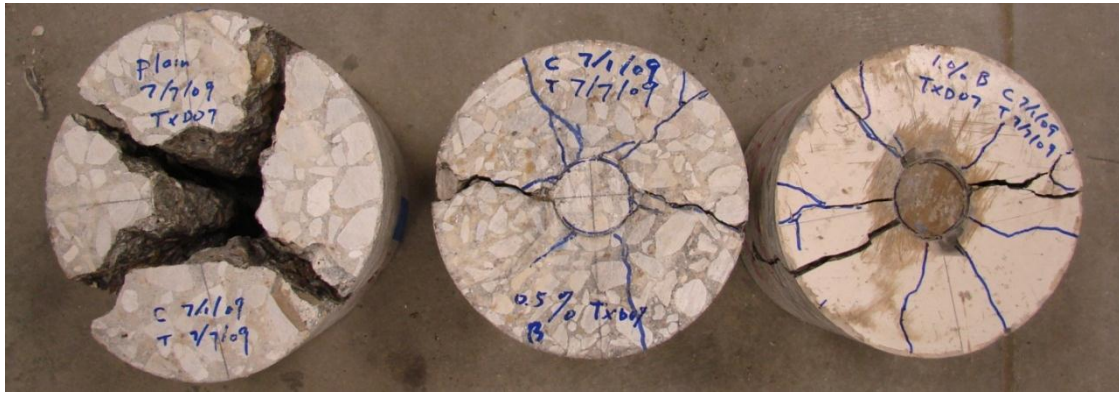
Typical Tested Photos Showing Radial Cracks
